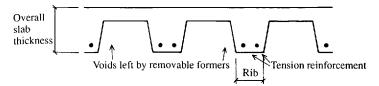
Cross-section through a ribbed slab cast on removable formers
